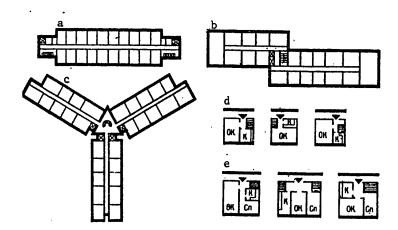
Layouts of corridor buildings and apartment plans for them. Configuration of the buildings: a--rectangular; b--with shift to increase lighting and ventilation of the corridors; c--three-leaved. Types of apartments: d--one-room; e--two-room; OK--living room; Cn--bedroom; K--kitchen.
